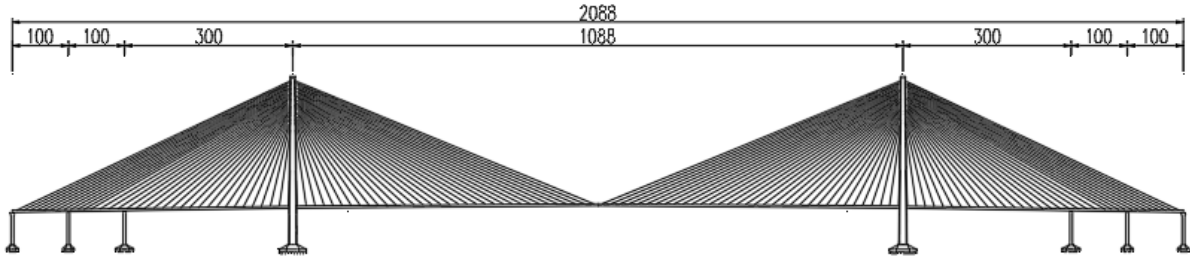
Span layout of the Sutong Bridge (Units: m)
